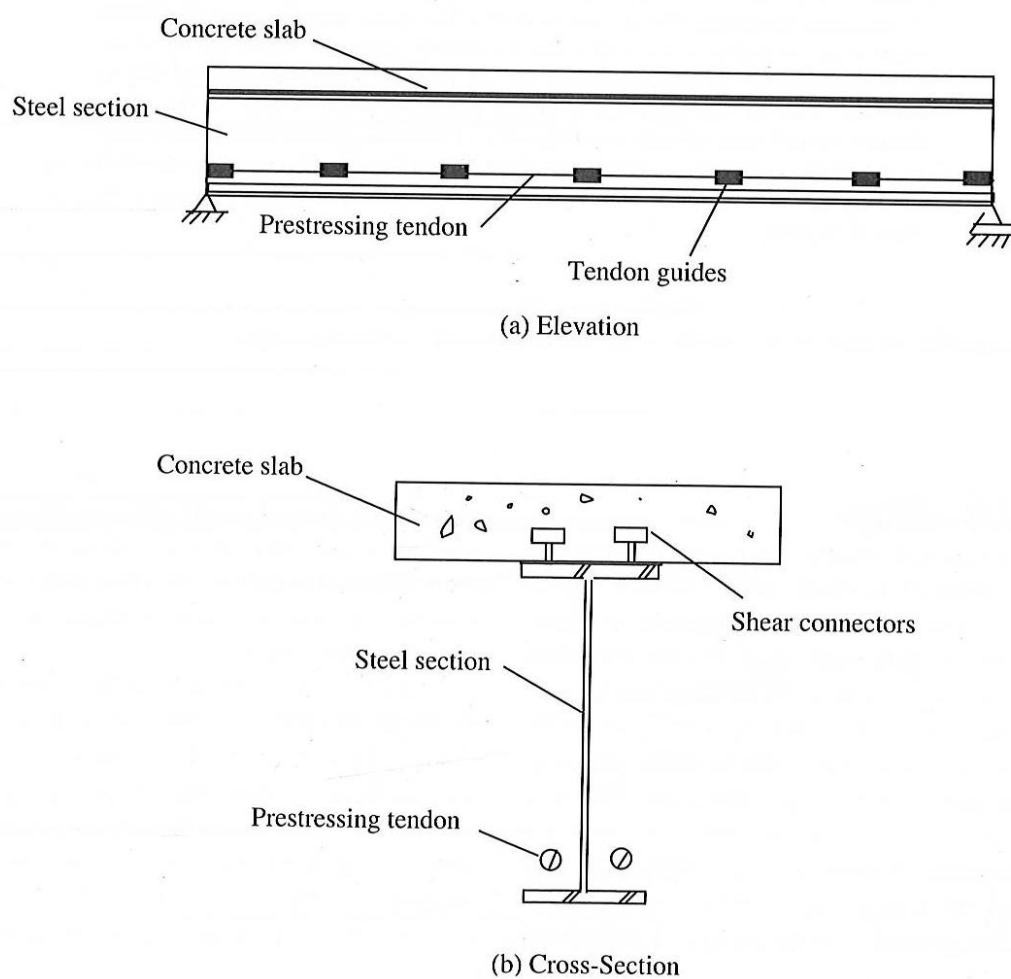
Elevation and cross section of post-tensioned composite beam (Uy & Craine, 2004).
